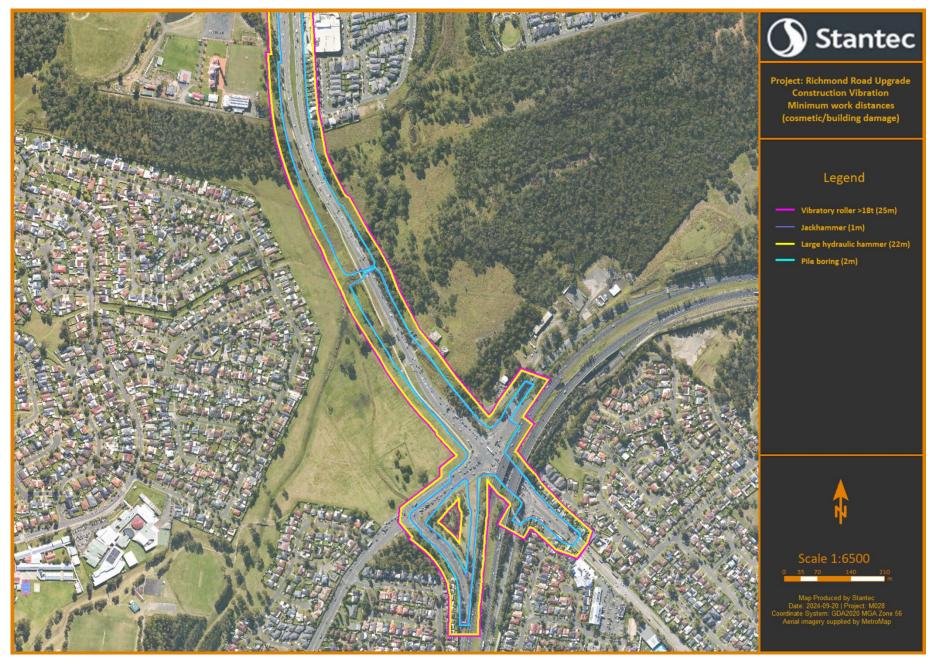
Predicted construction vibration impacts – Minimum work distance for cosmetic damage – Large plant/equipment – Southern section
